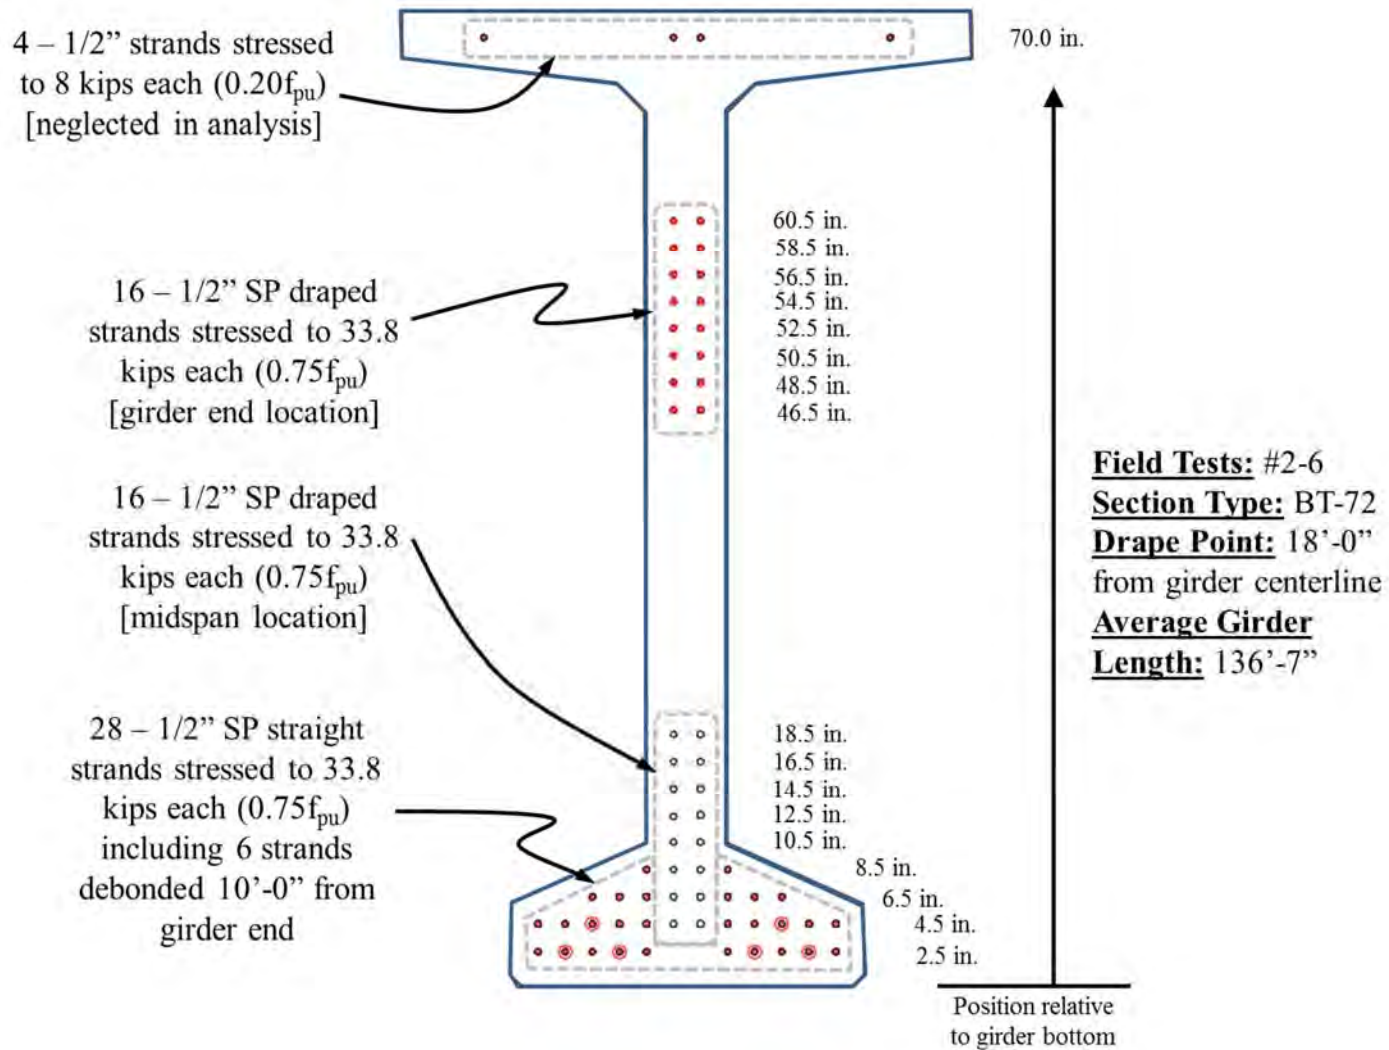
Girder and Prestressing Strand Details for Field Tests #2-6
